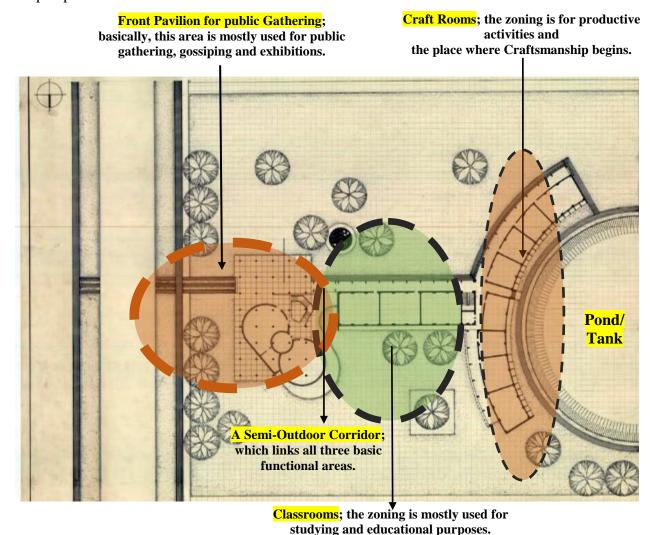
Ground Floor Plan of Faculty of Fine Arts, Dhaka (Archive, n.d.)
